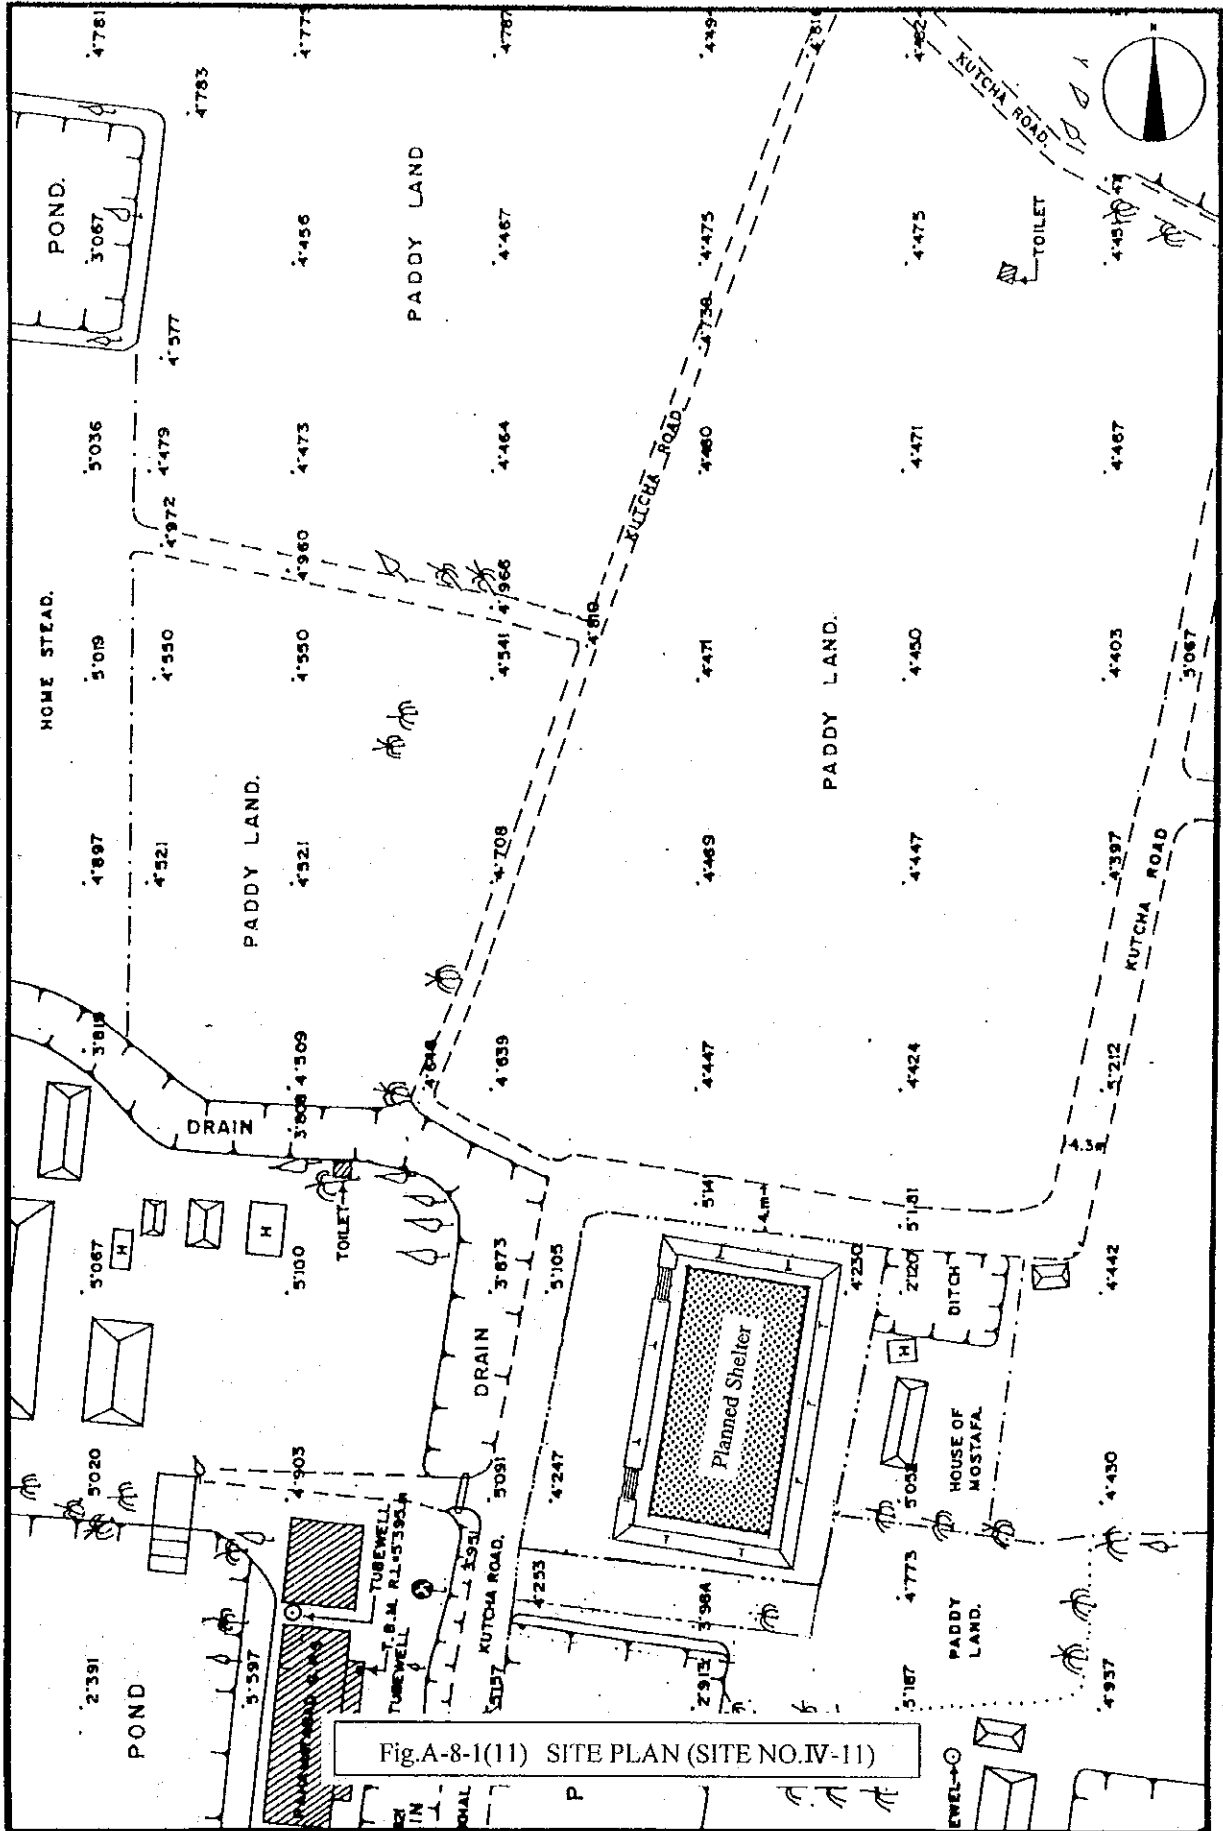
(11) SITE PLAN (SITE NO.IV-11)
